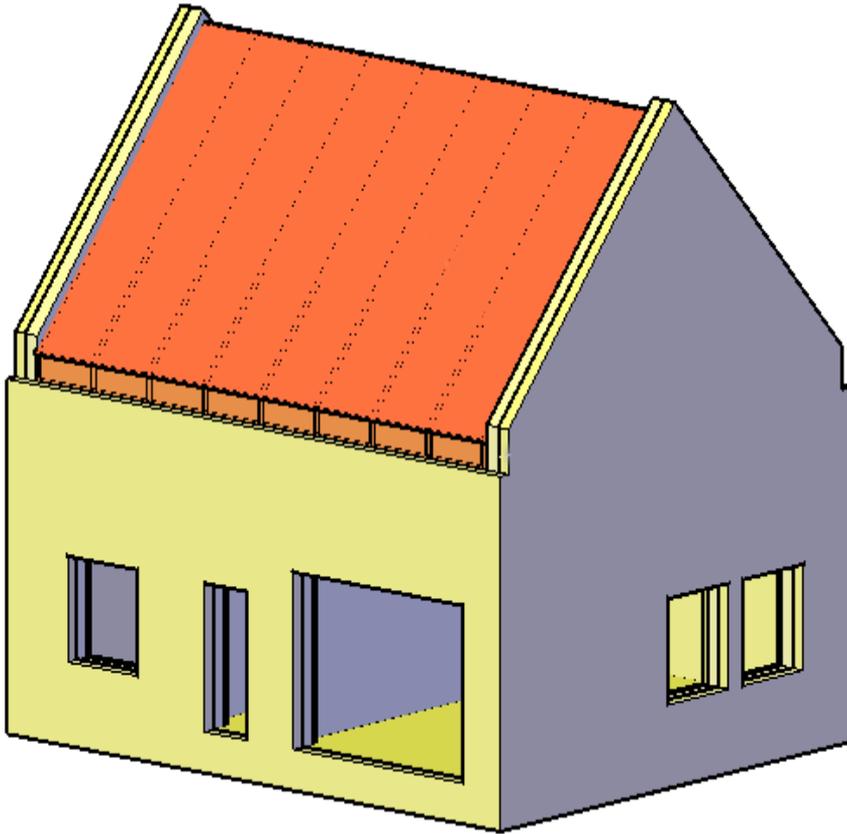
View of modeled passive house with finished external barriers, roof and ceilings construction
